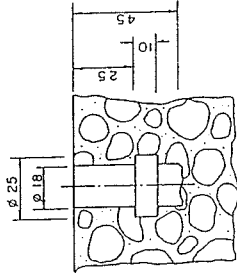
Hole and groove drilled out for the so-called CAPO-TEST pullout system. (Dimensions in mm).
